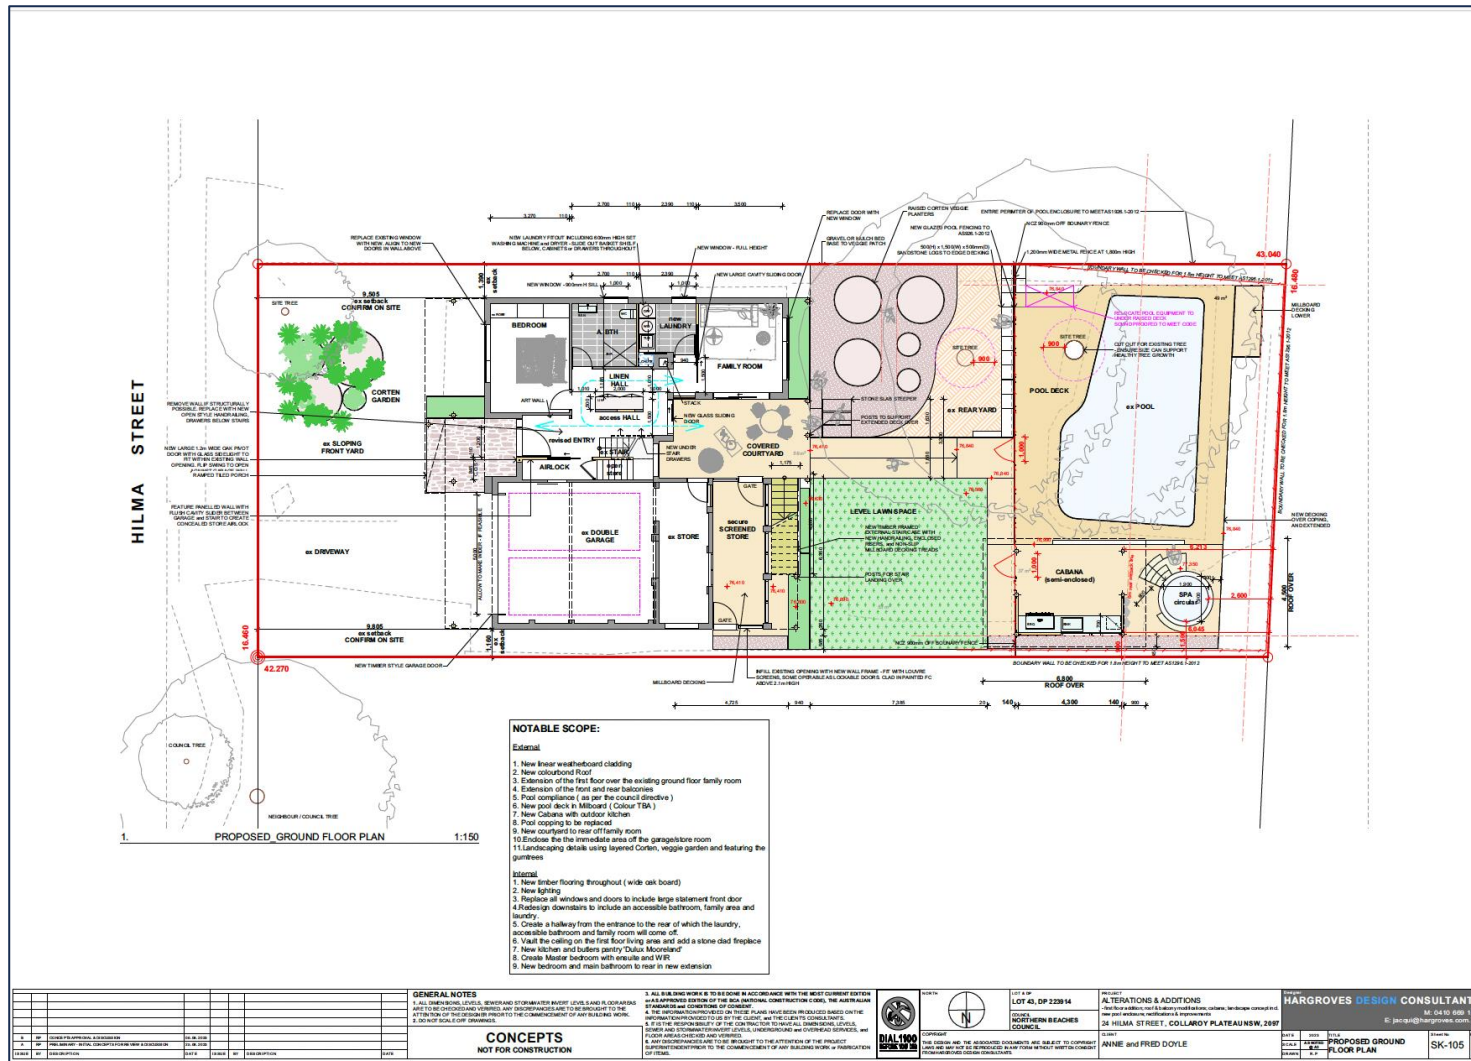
PROPOSED GROUND FLOOR PLAN
